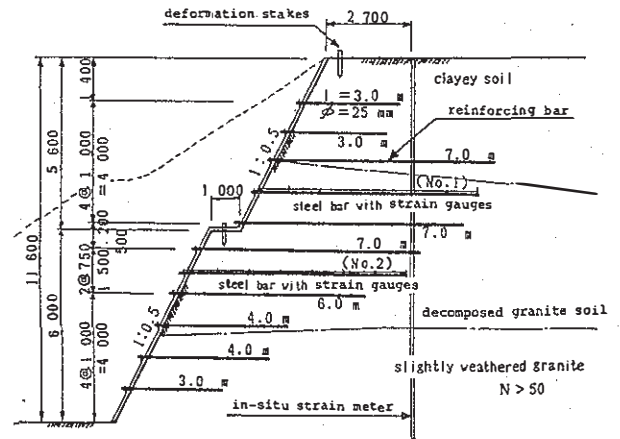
View of reinforced slope and arrangement of field measuring equipment
